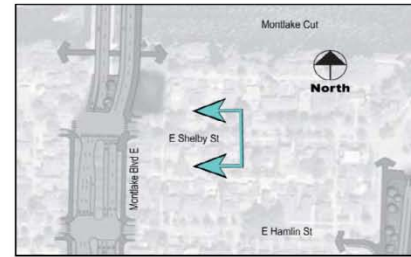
ESSB 6392 Workgroup Route Recommendations, Sections at Hamlin and Shelby streets
